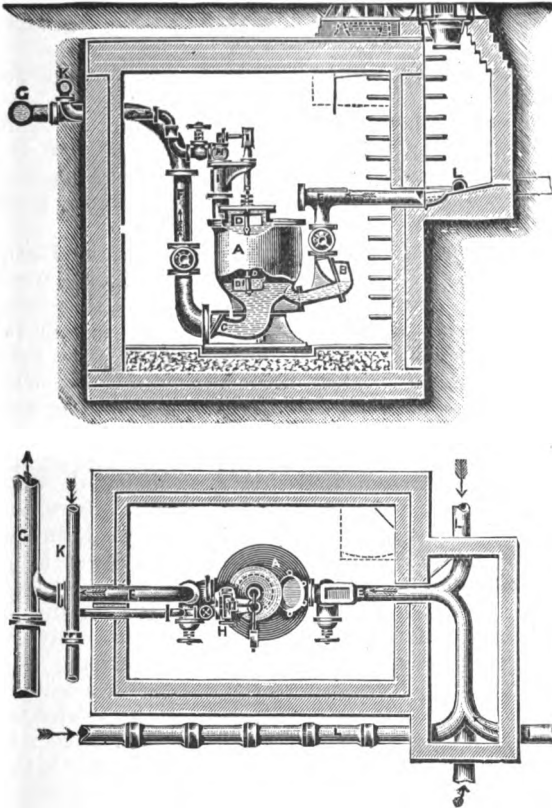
Shone's pneumatic ejector in brick chamber.
